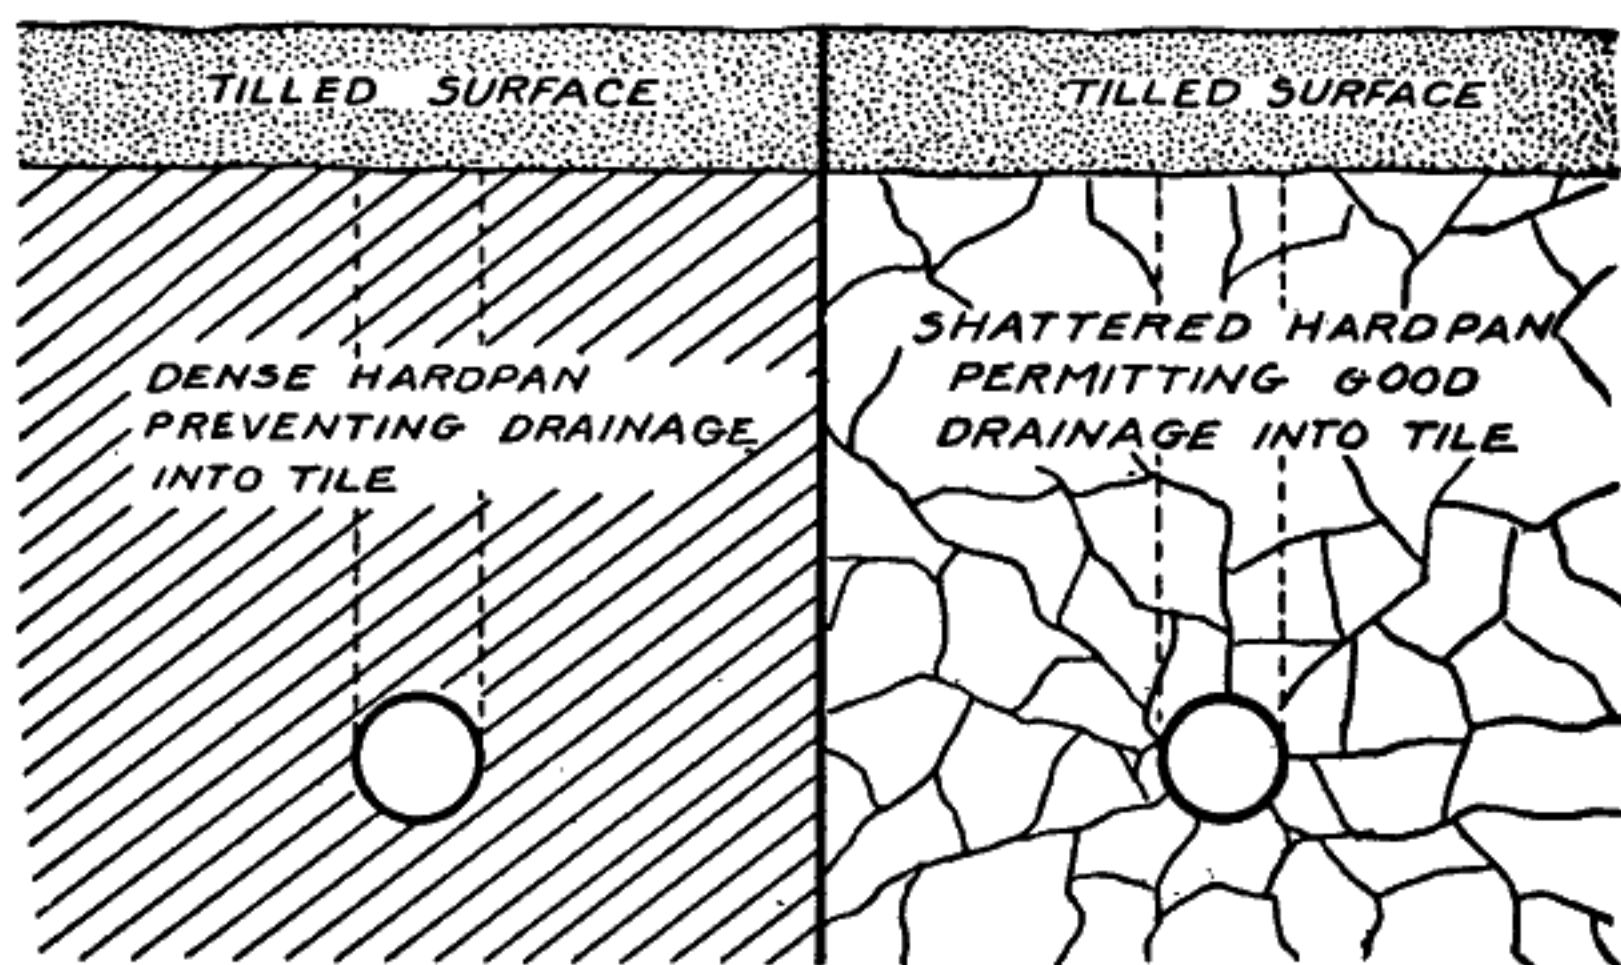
Often hardpan prevents the drainage water from passing into tile or open drains. The relief is through blasting, which opens up the needed drainage courses. Such blasts are loaded exactly as for subsoiling, but must be kept well away from the tile.
